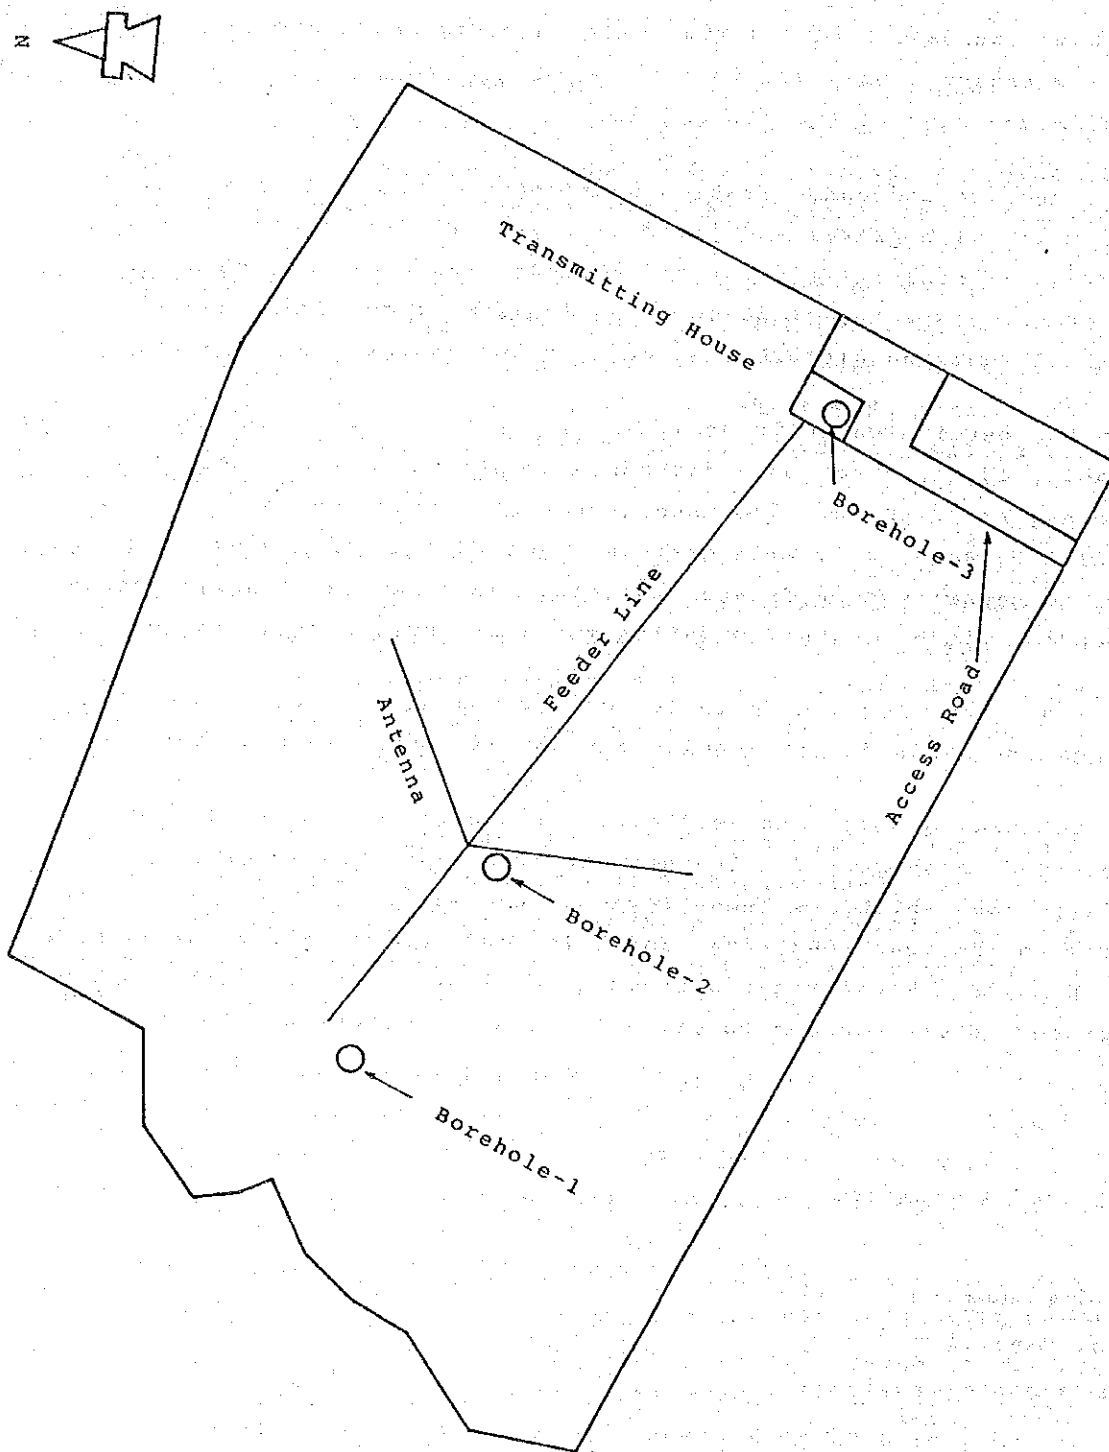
Site plan of Surkhet medium wave transmission tower station (Scale: 1/2500)
